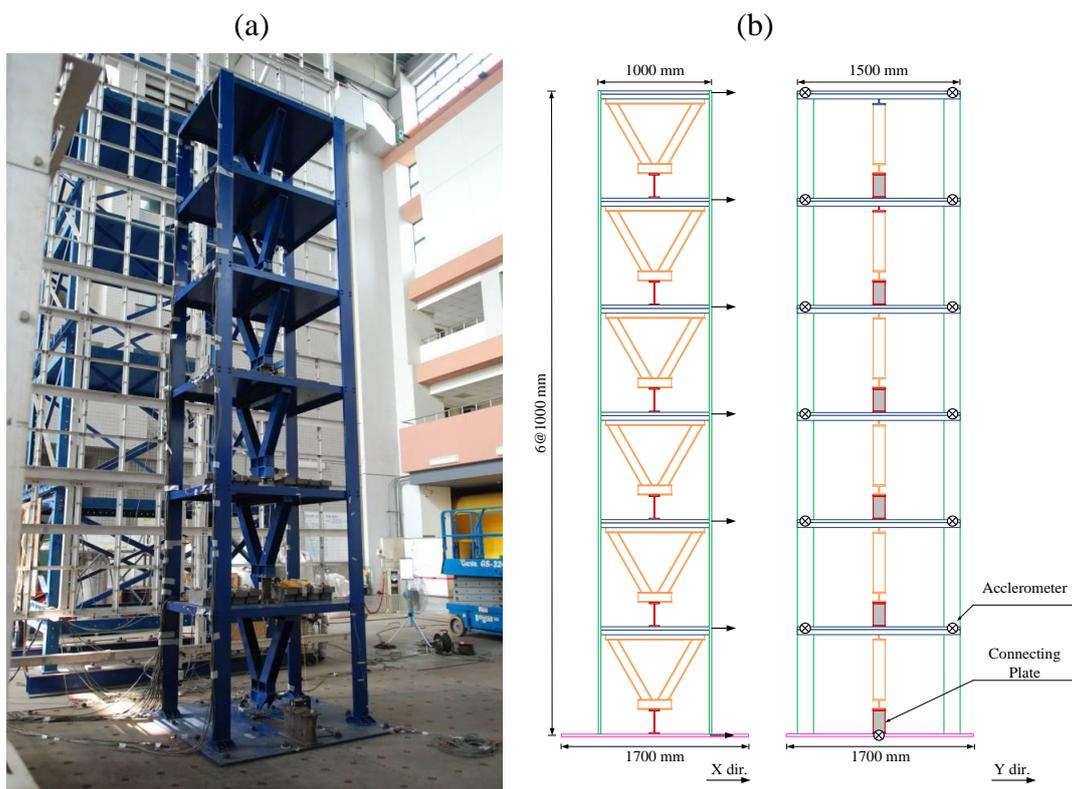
A 1/4-scale 6-story steel building structure: (a) an overview and (b) plane views.
